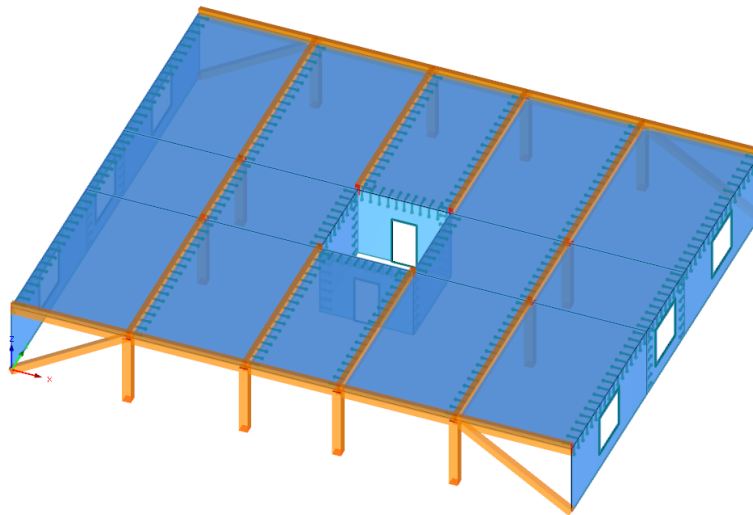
First floor of reference building with marked line hinges for the CLT elements.
